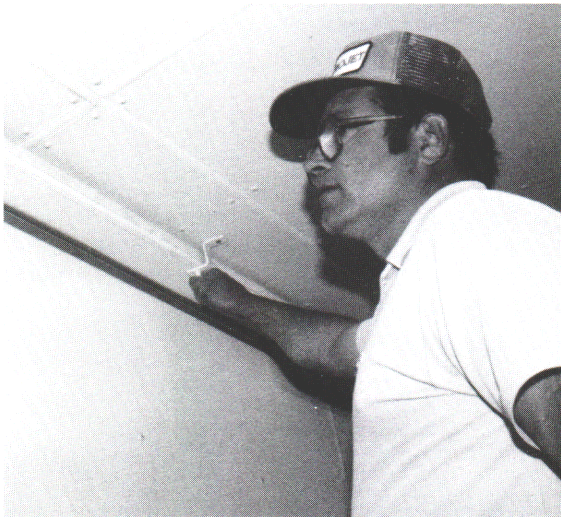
Plywood duct built around the continuously running fan to draw air from near the floor and throttle down a large fan.
